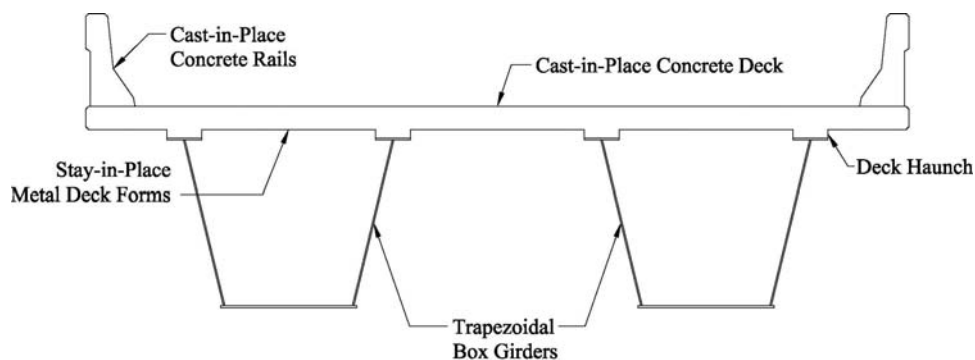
Cross-section of the trapezoidal box girders, deck, and rails
